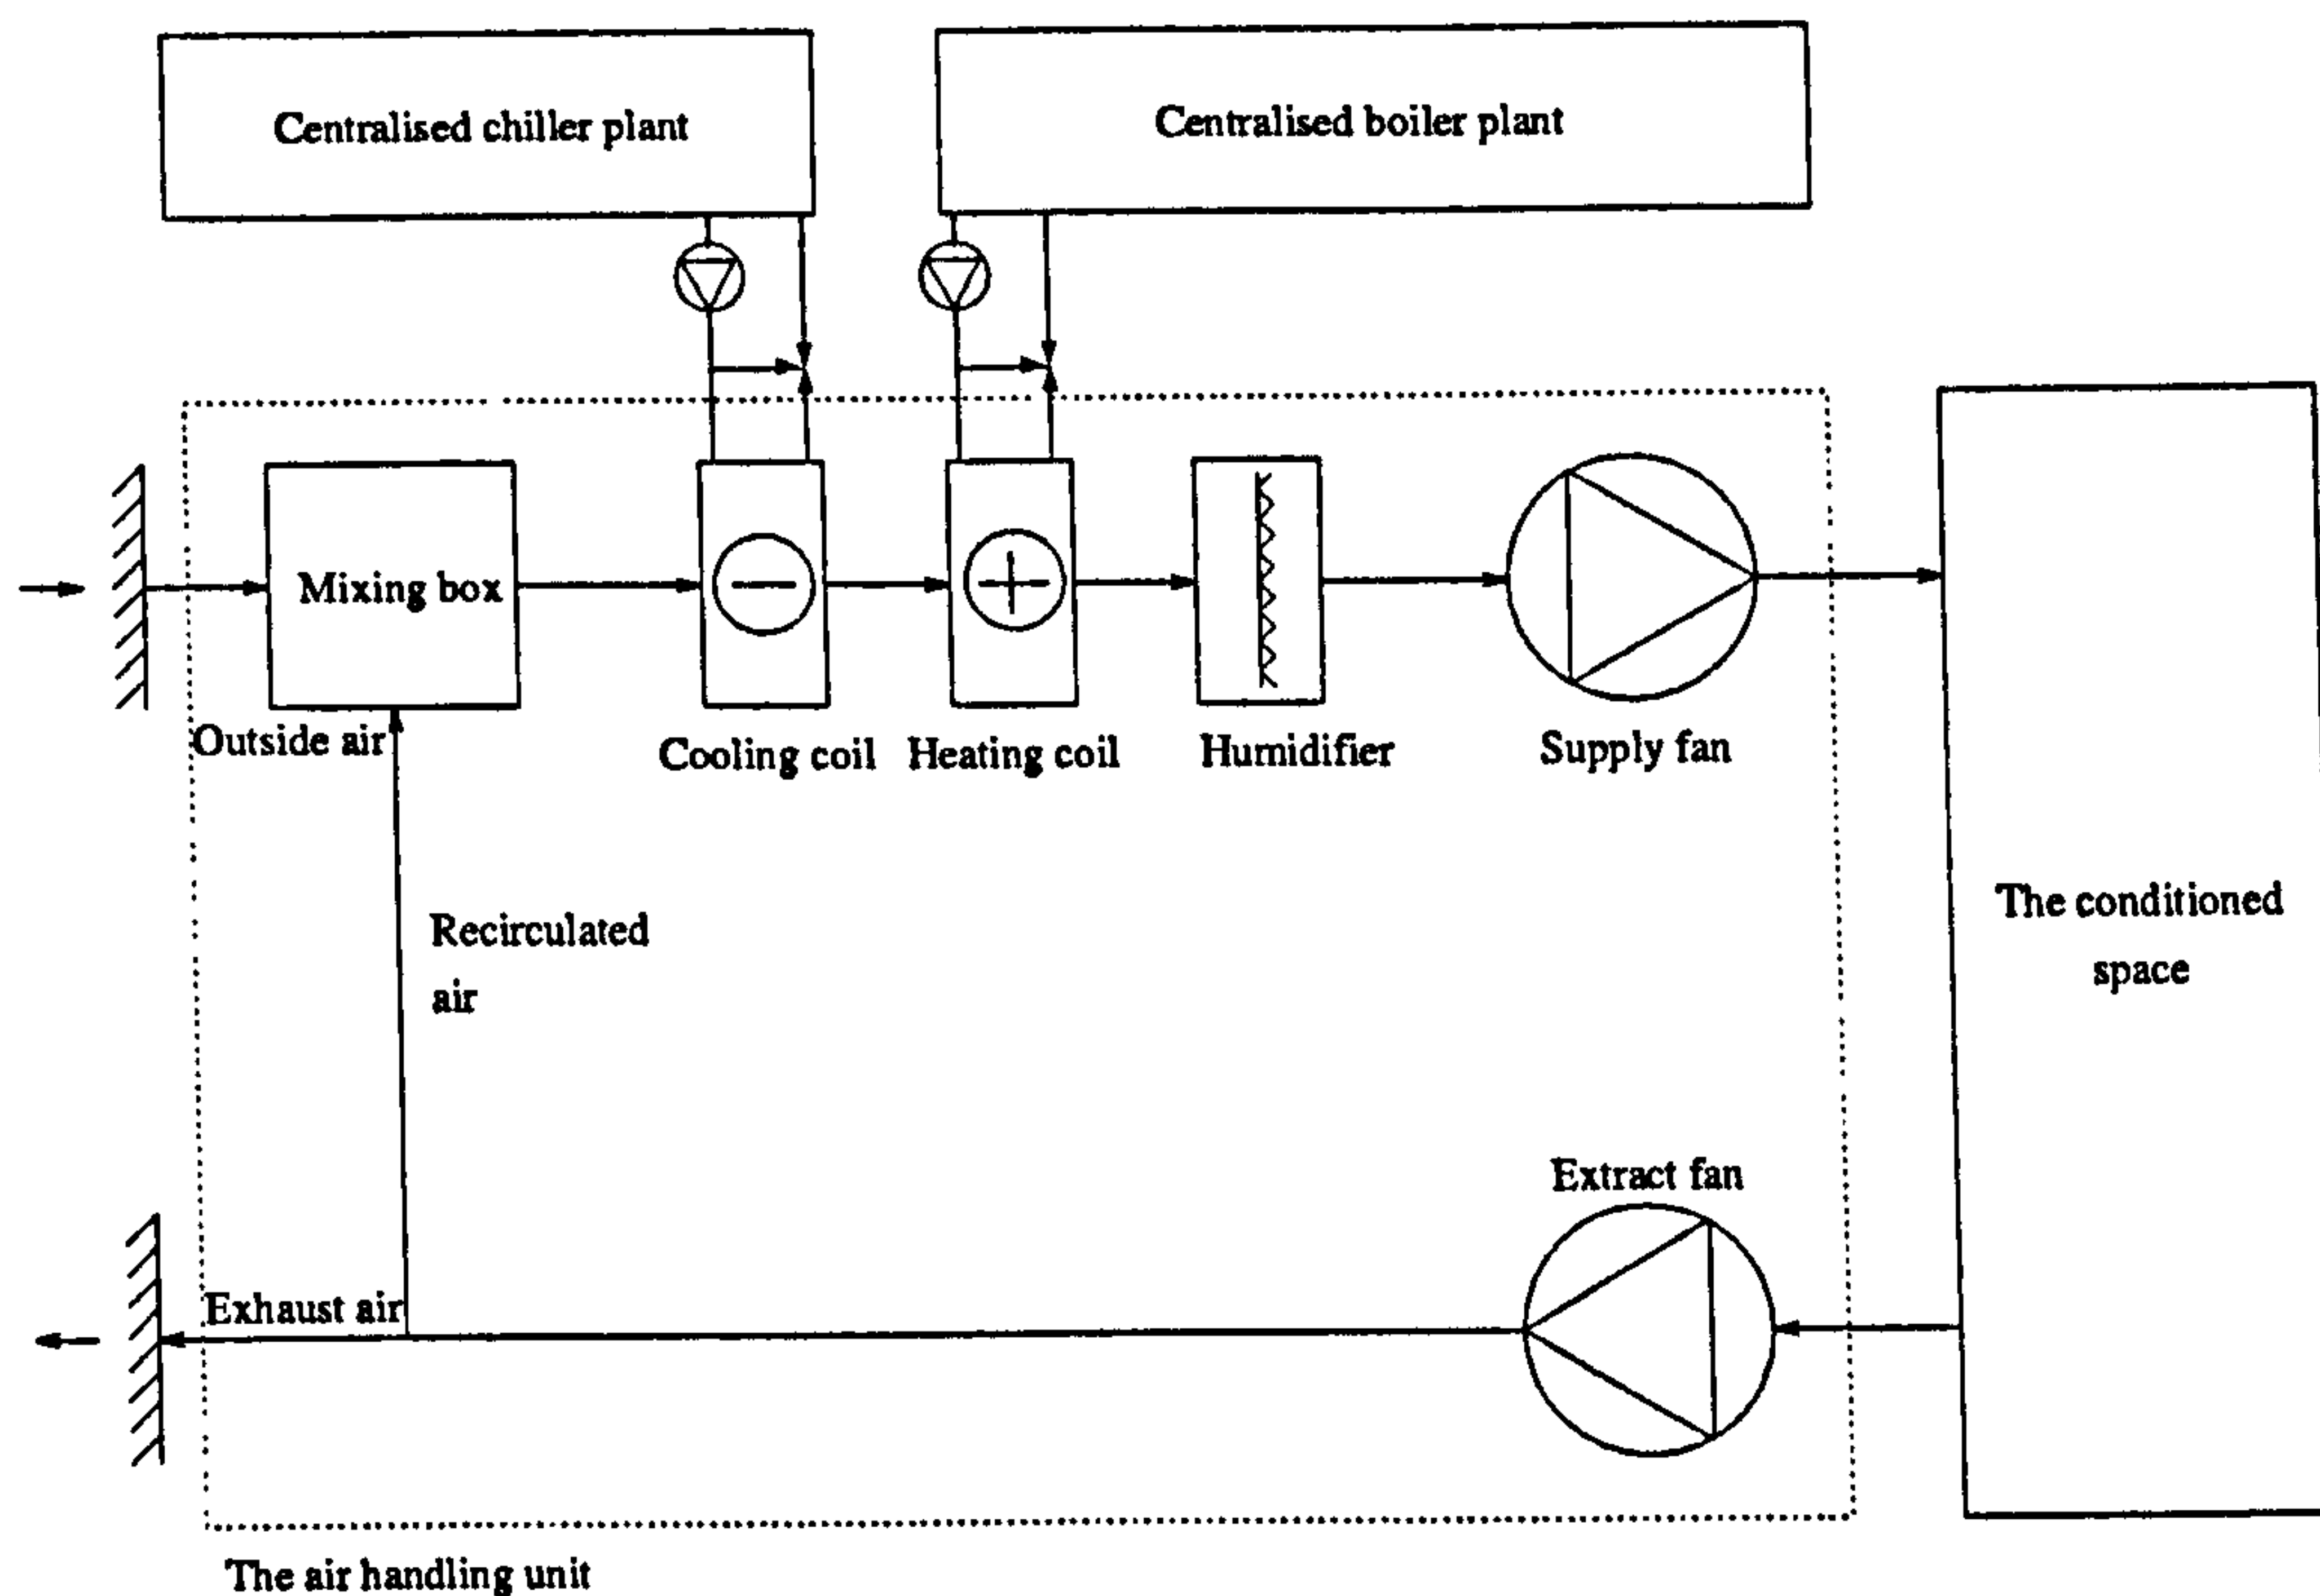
The Layout of Typical HVAC Plant Installation.
